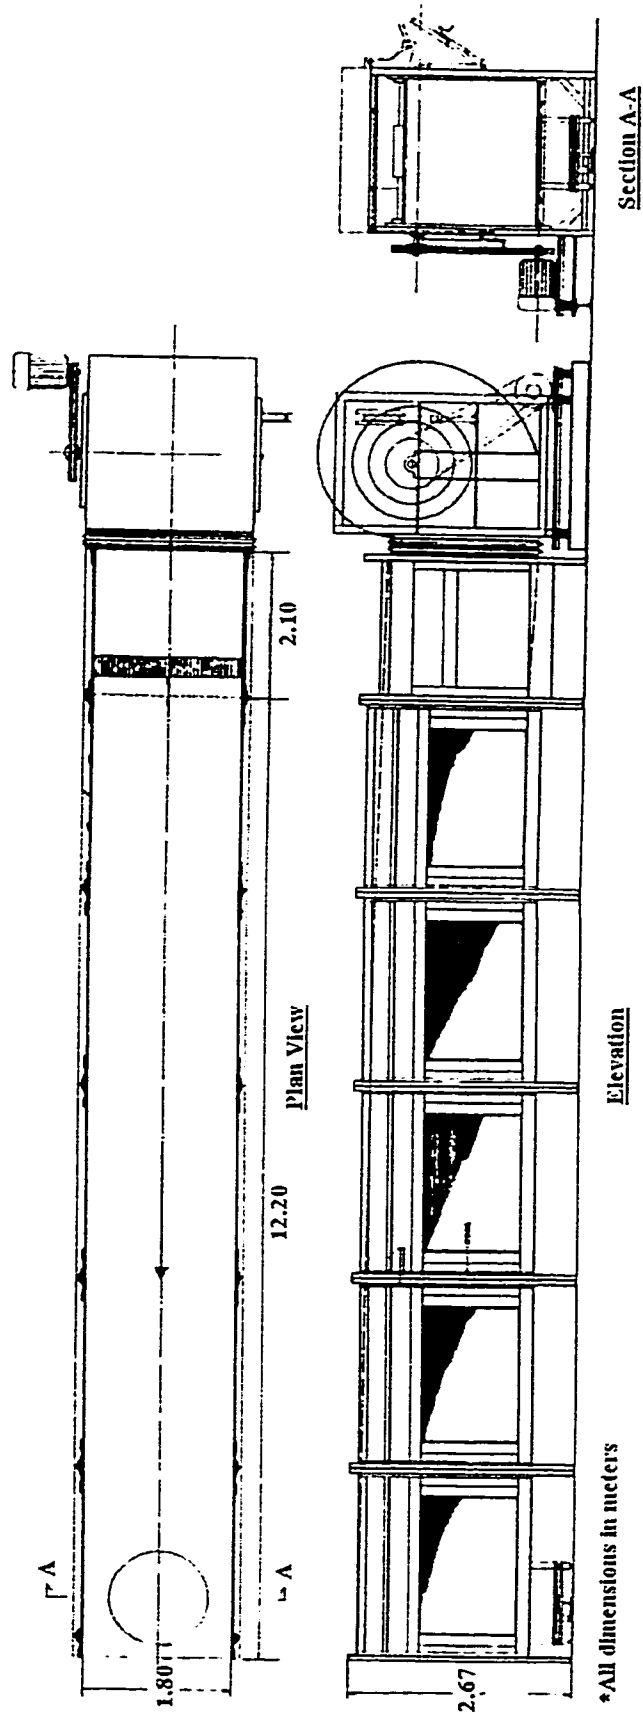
Plan view, elevation and section view of the boundary layer wind tunnel at C.B.S.
